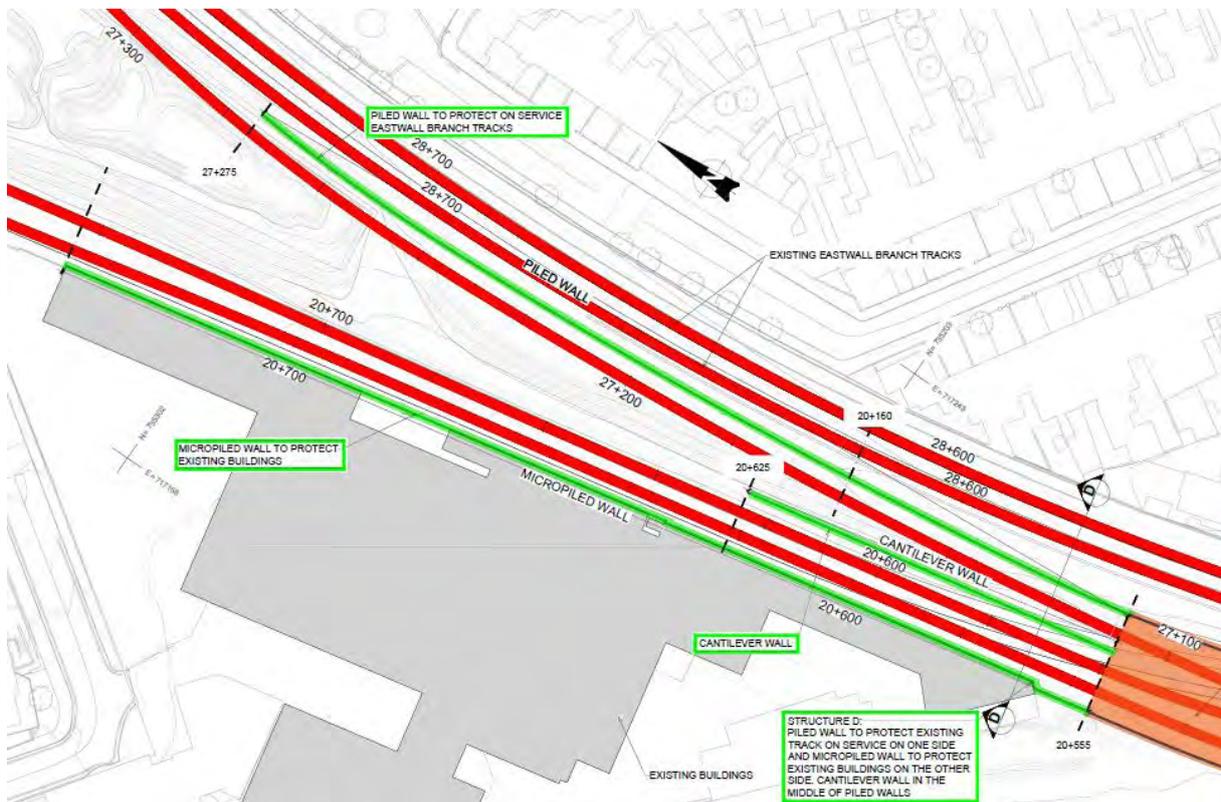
Spencer Dock proposed walls and protection slabs - Structure D
